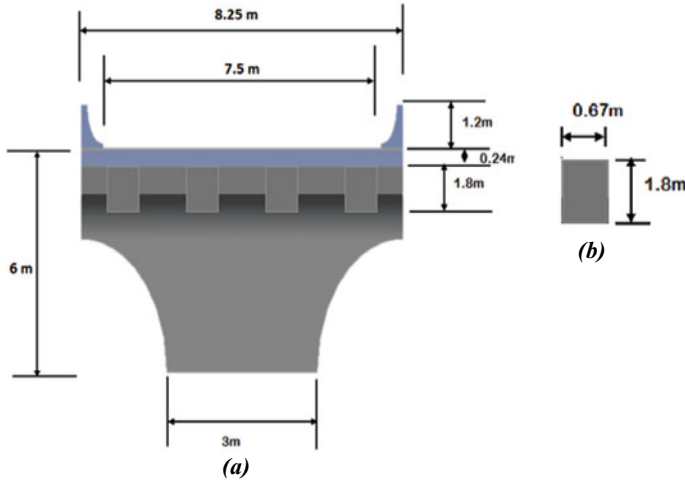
a Various dimensions of the cross section of deck and pier. b Cross section of the longitudinal girder
